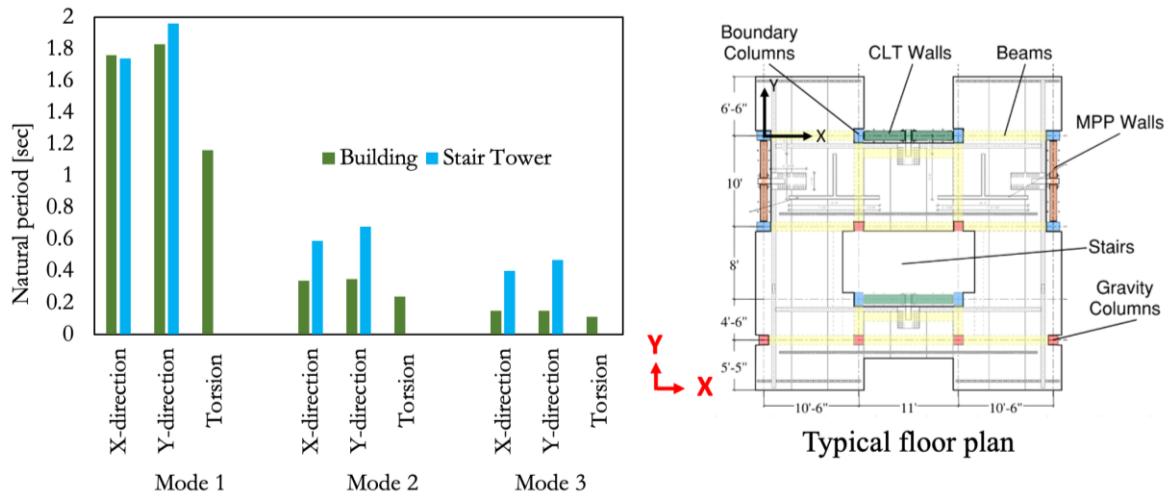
Natural periods of the building and the stair tower (Left), and a typical floor plan (Right (Wichman *et al.* 2022b))
